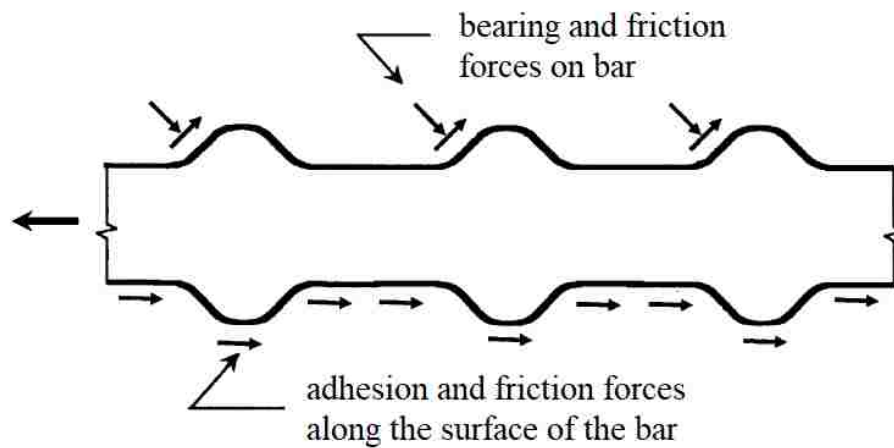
Forces Transfer Between Steel and Concrete (ACI 408R, 2003)
